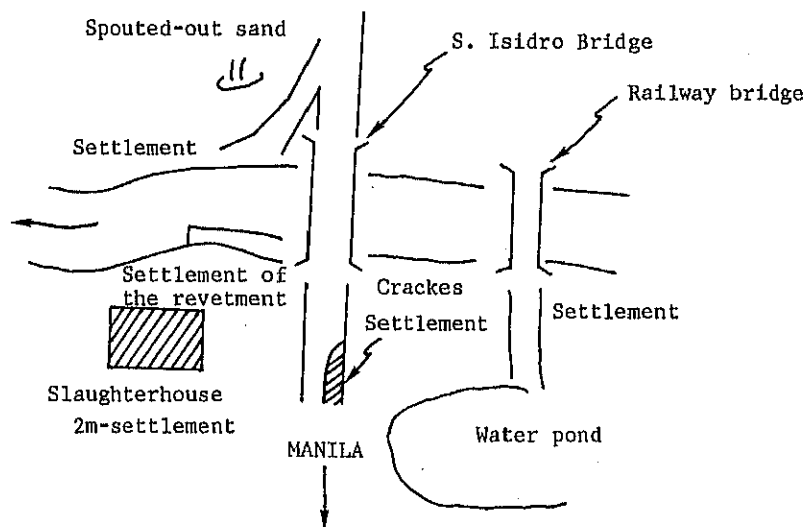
Sketch of the S. Isidro Bridge and Its Surroundings
